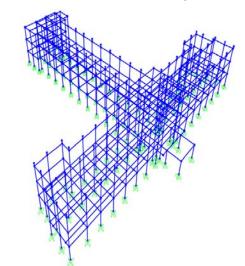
Three – Dimensional Model of Saint Vincent Building
